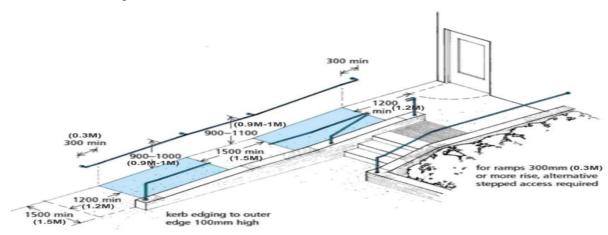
Minimum dimension for ramp construction (ADA, 2015)
